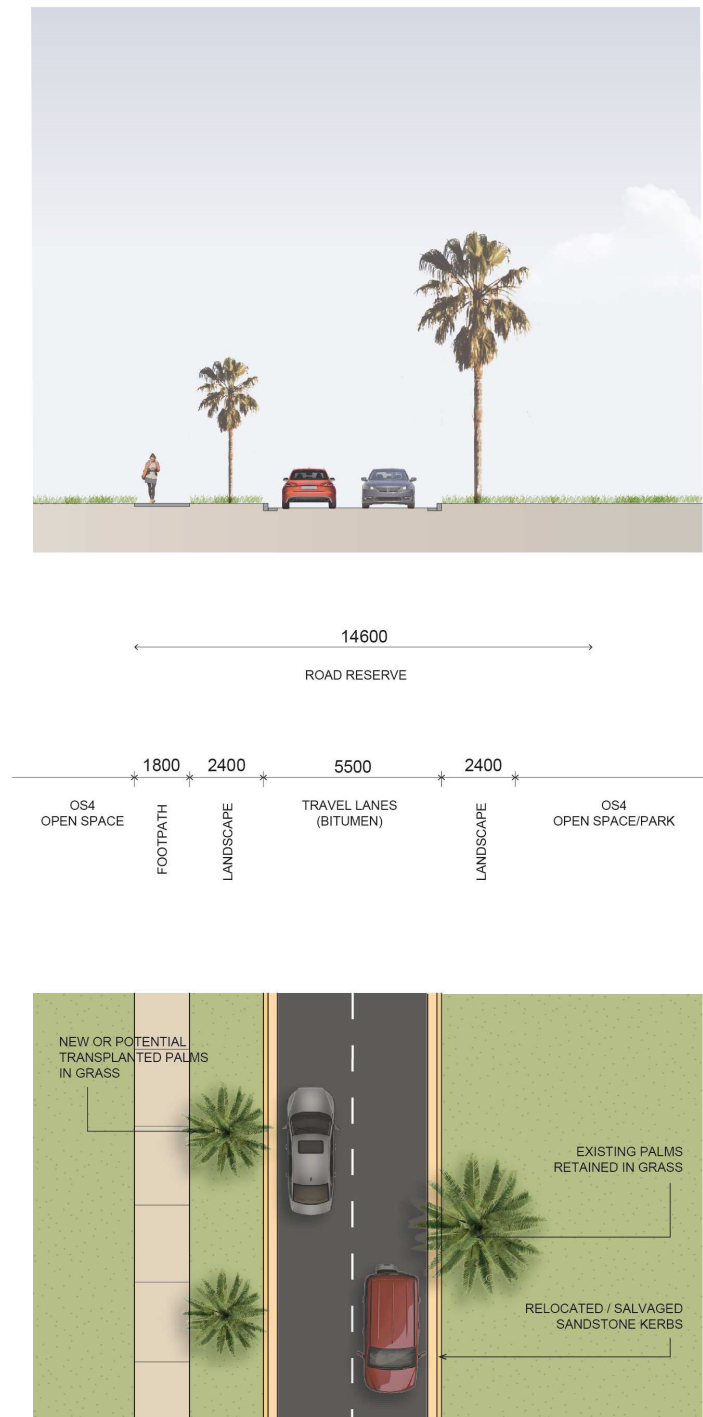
Typical street section 2 – Greenup Drive
